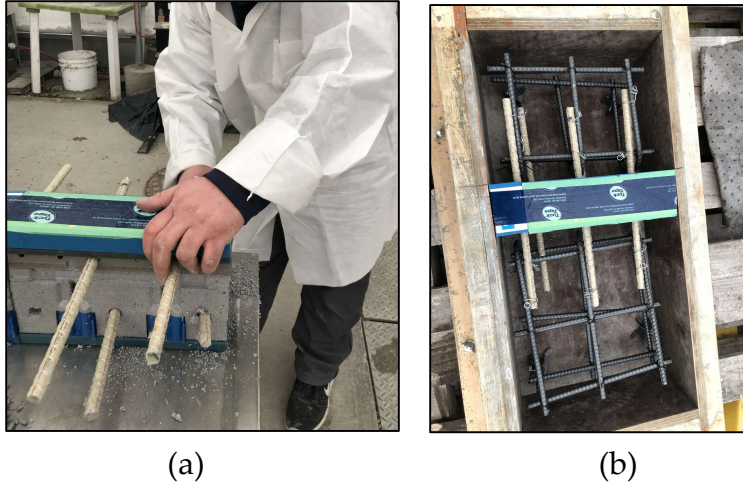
Thermally interrupted slab with glass fiber reinforcement:
